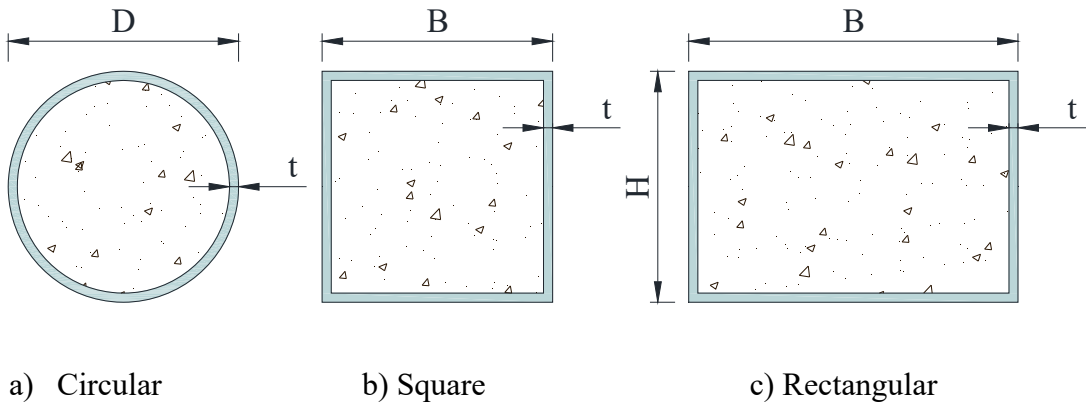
Concrete filled steel tubular sections studied: a) Circular; b) Square; c) Rectangular.
